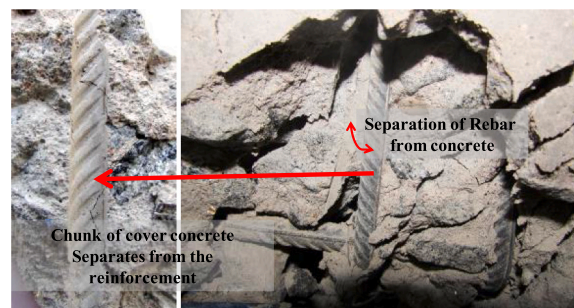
Failure of bond between concrete and steel from a member exposed to heating for 60 mins followed by cooling.
